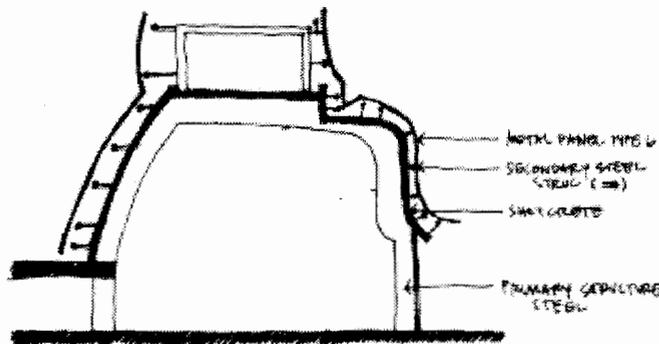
Section diagram through Disney Concert Hall Founders' Room
